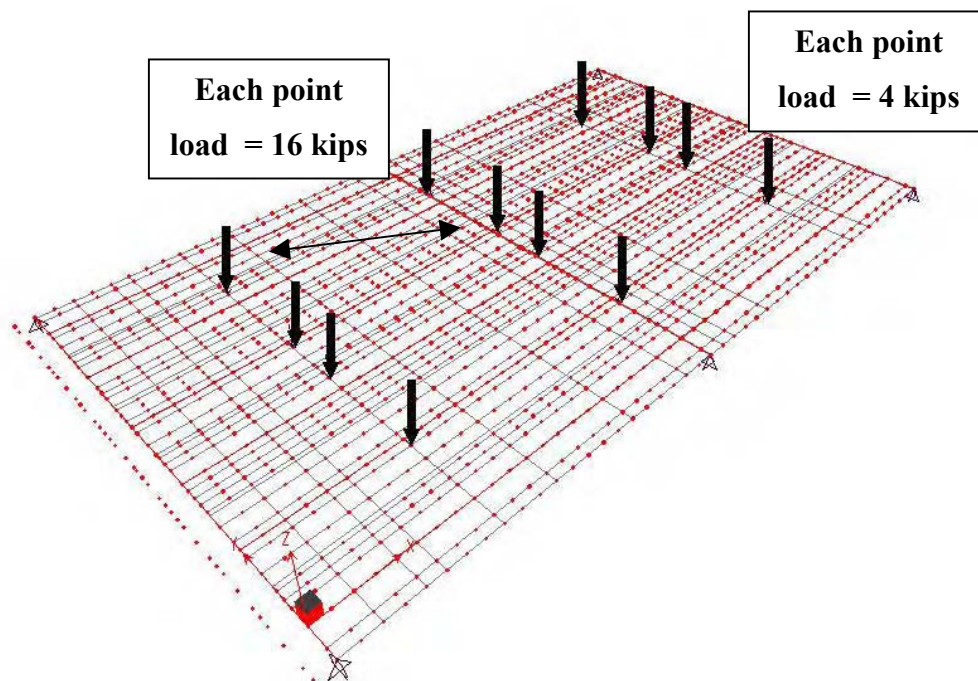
Twin HS20 truck loadings on finite element model for maximum beam response
